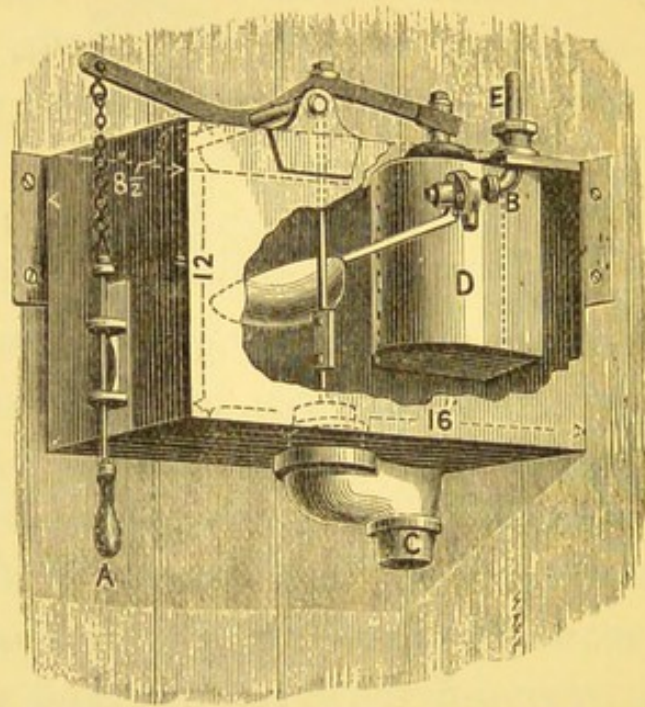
View of "SLUICE" Apparatus for Flushing out W.C.'s, &c.
